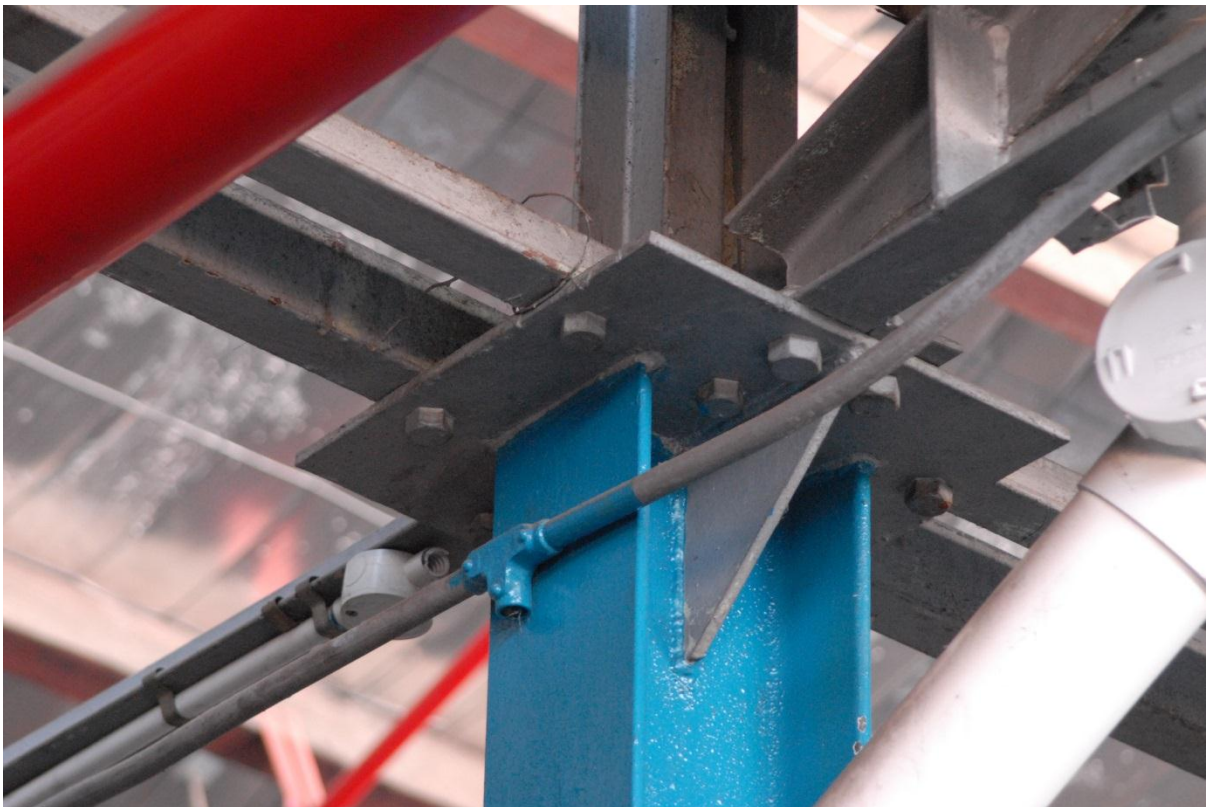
Detail of 6-way roof join and plate, near wall, (image no. B99 0154)
